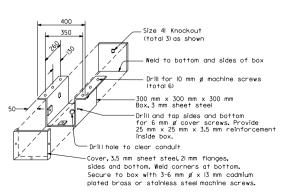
DETAIL P PENDANT SOFFIT LUMINAIRE INSTALLATION
